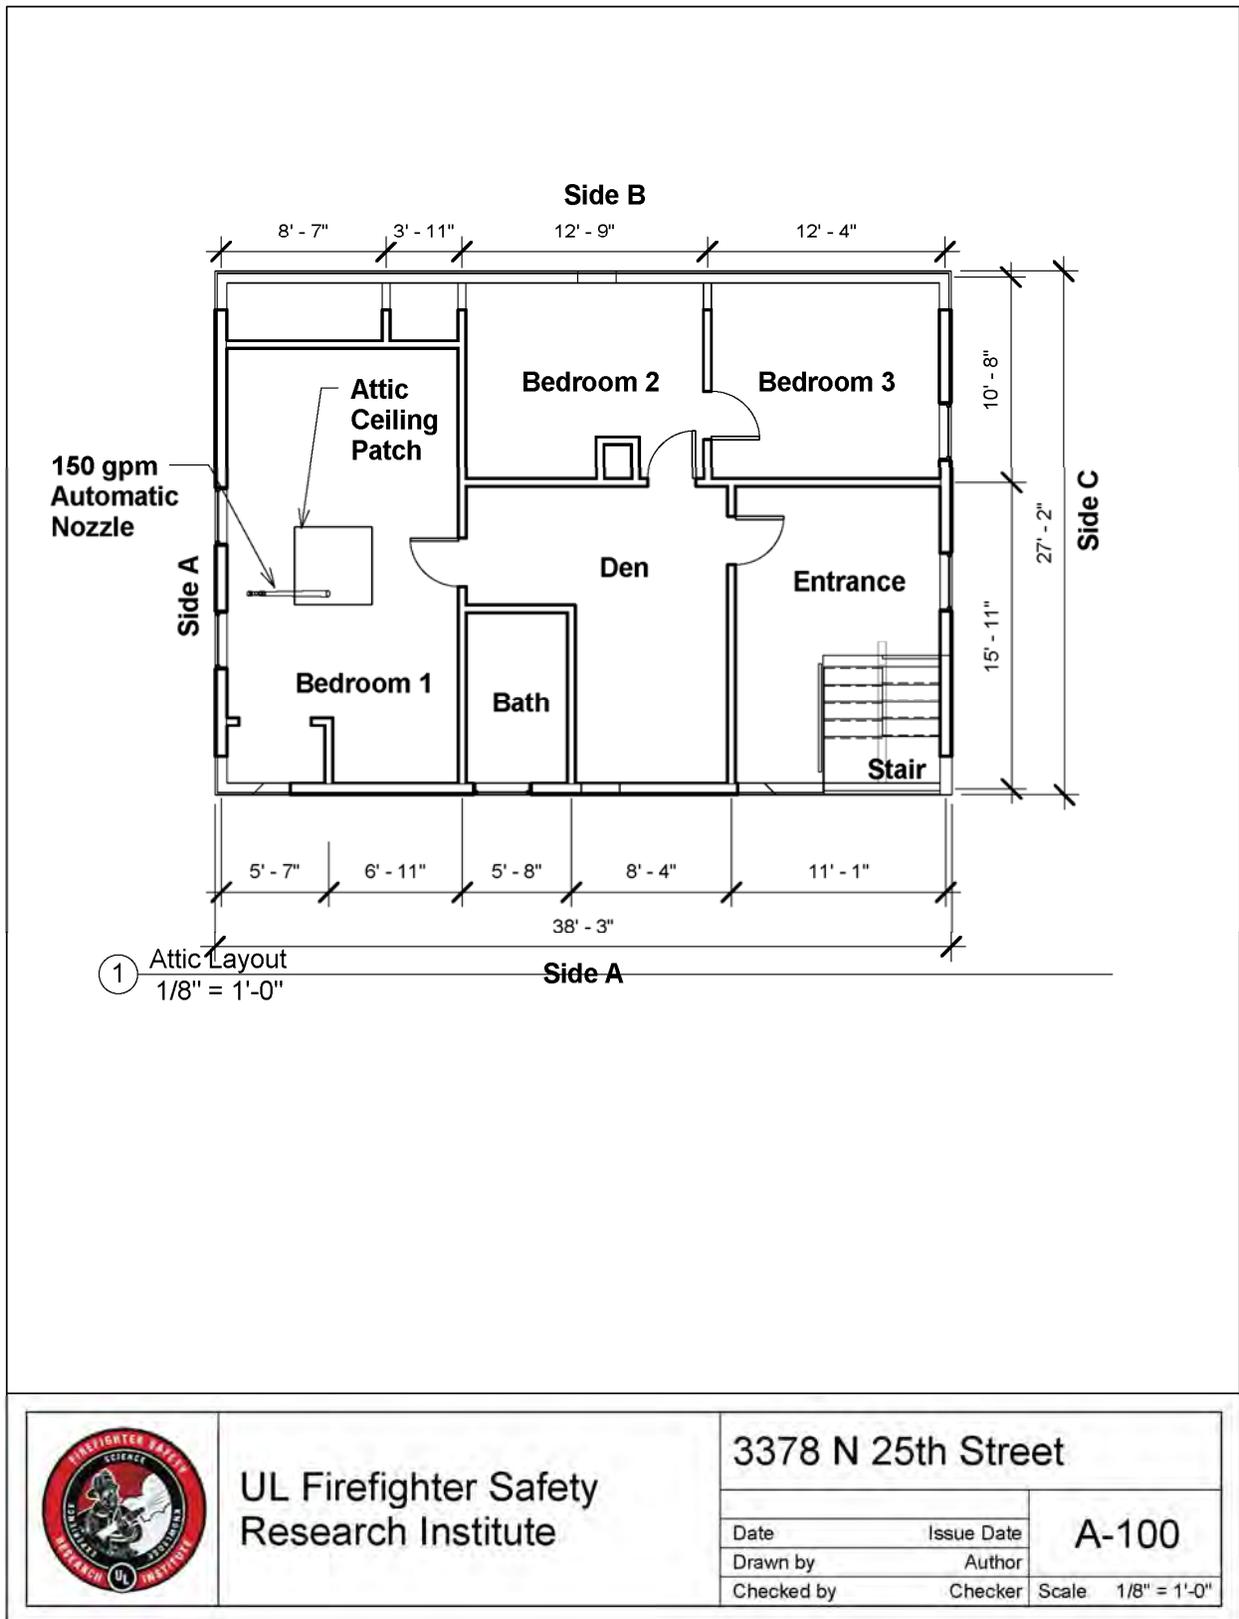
Experiment 3 – 3378 Nth 25th Street Layout Drawing
